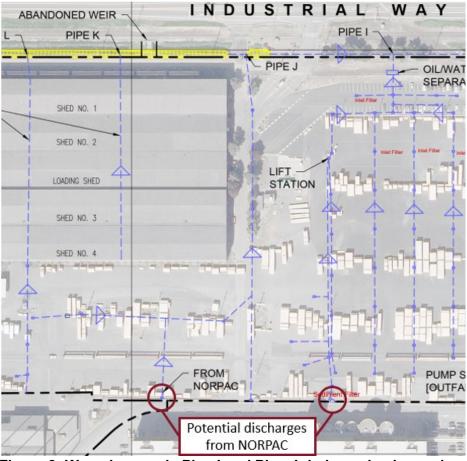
Weyerhaeuser's Pipe I and Pipe J drainage basins and potential discharges from NORPAC.
